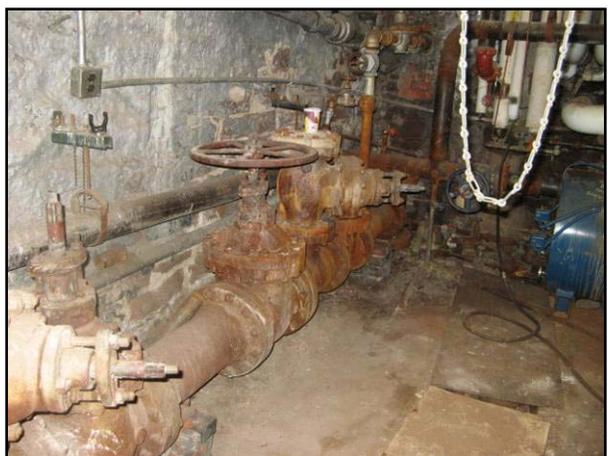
Sample of Corroded Piping in Basement Mechanical Room
